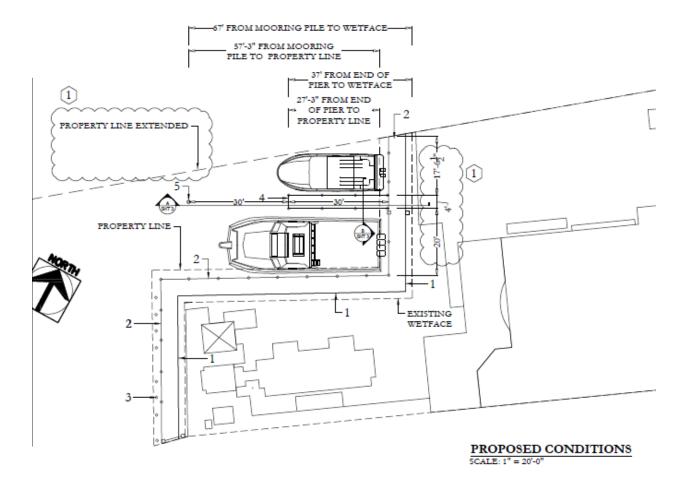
Proposed Finger Pier and Mooring Pile (per submitted plan)
